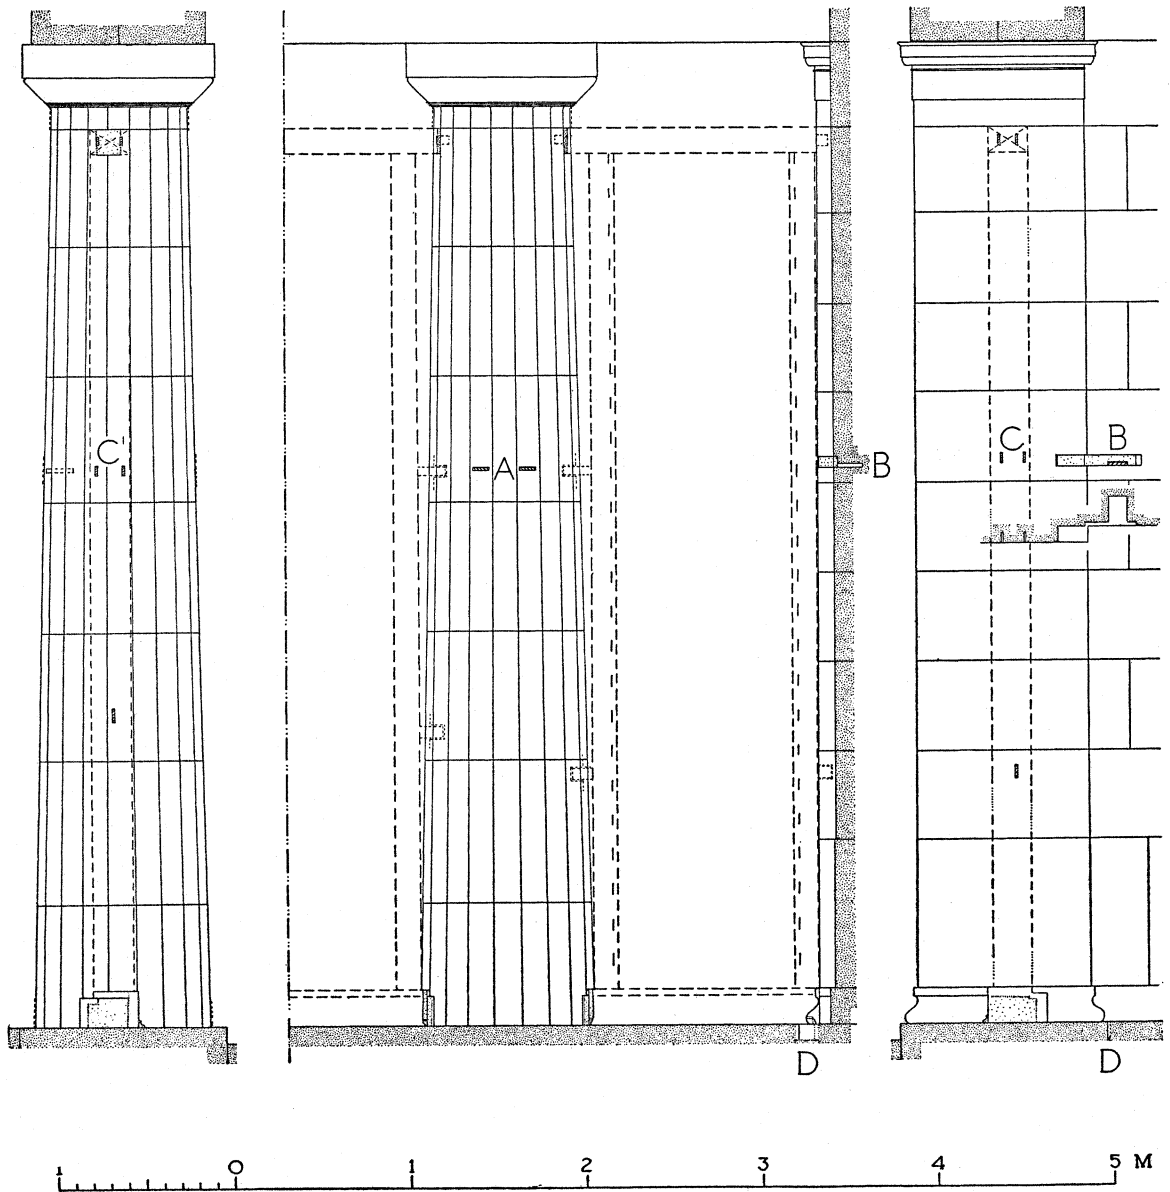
Details of the North Column and North Anta of the Opisthodomus:
